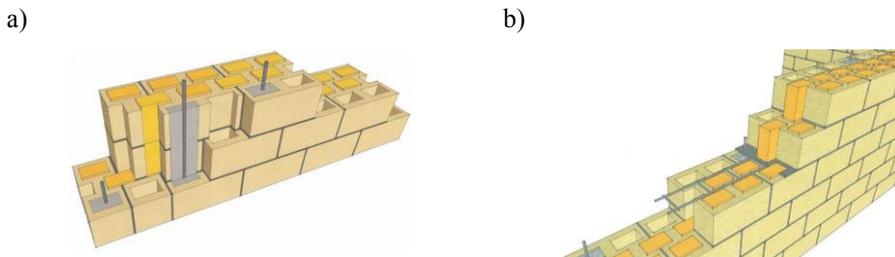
Schematic masonry structure, where: a - the vertical reinforcement of columns, b - horizontal reinforcement rods.
